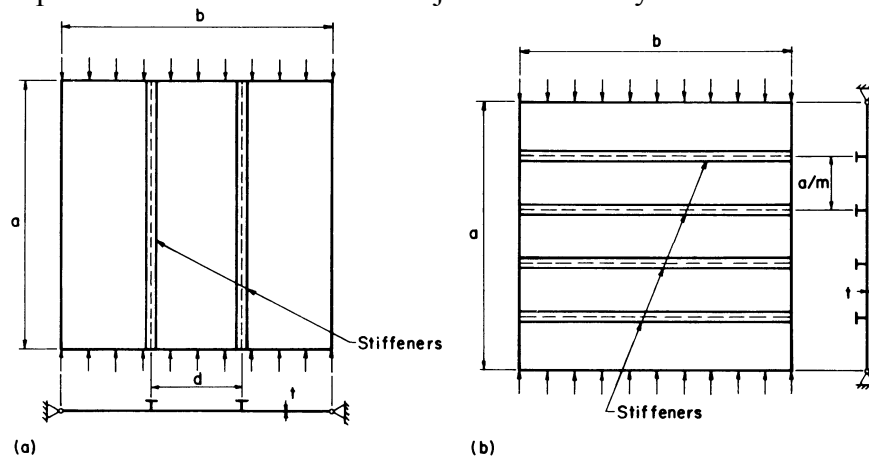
Stiffened plate panels; (a) panel with longitudinal stiffeners; (b) panel with transverse stiffeners.
